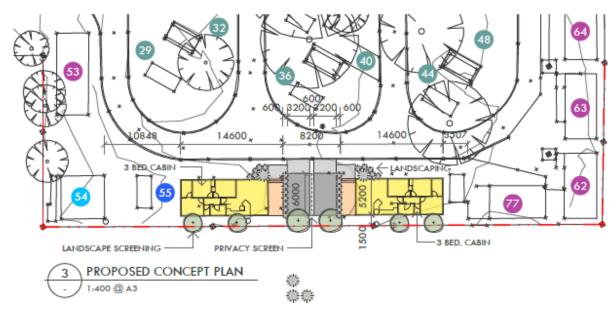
Proposed site plan/concept plan, By Tasman Holiday Parks
